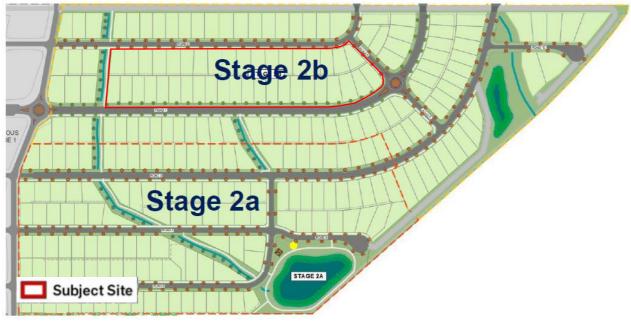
Plan of Stage 2 of Elm Grove Subdivision
